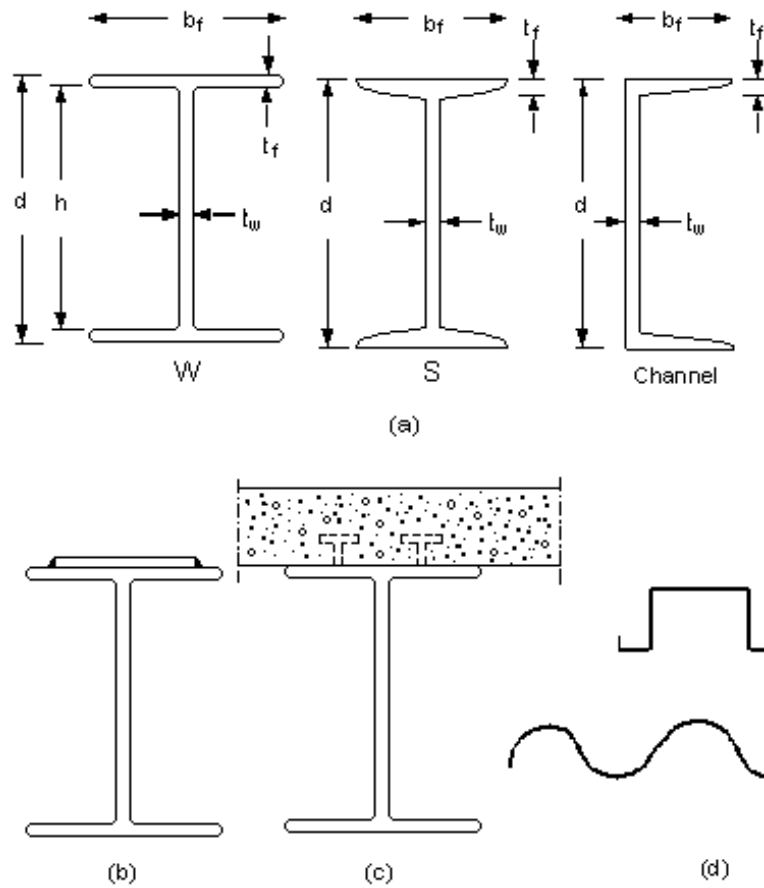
Different type of beams. a) standard hot-rolled sections, b) plate covered section, c) composite beam, d) sheet beams.
